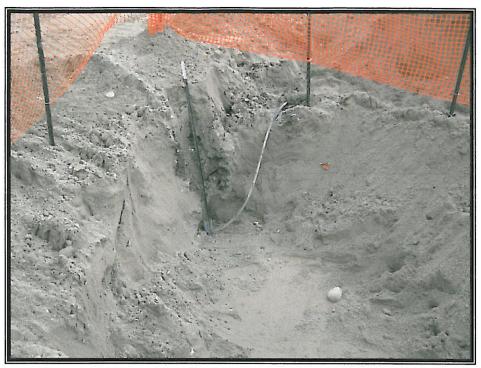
Northern Excavation Wall and Progressing Excavation Area
